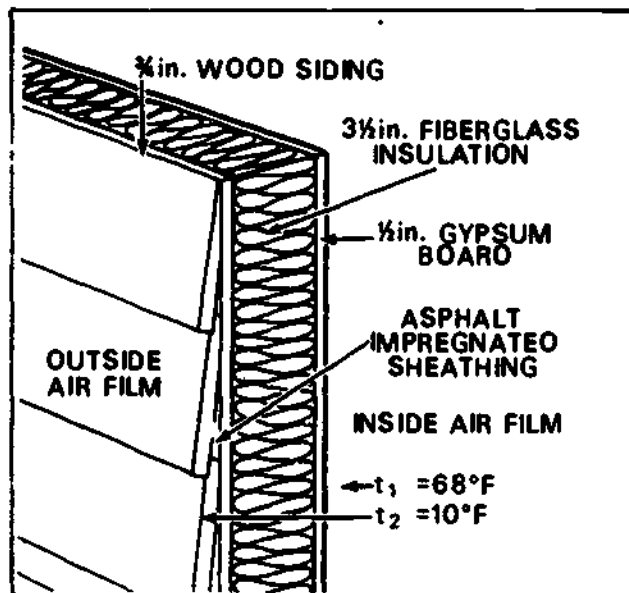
Sketch of wall section for conduction heat flow through a composite wall.
